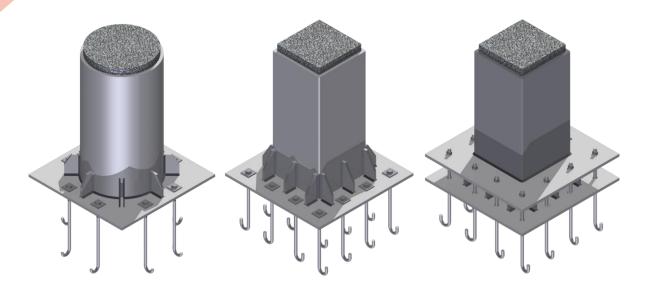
Typical exposed column bases for concrete filled steel tubular columns
